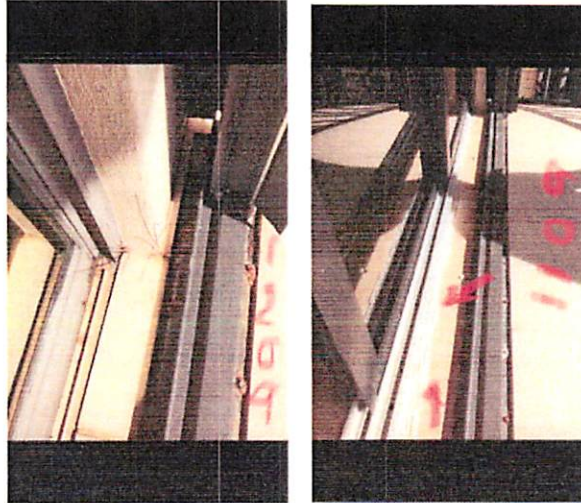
Exterior sealant past its serviceable lifespan at sealant between the window/door frames and masonry/concrete walls & balcony floors
